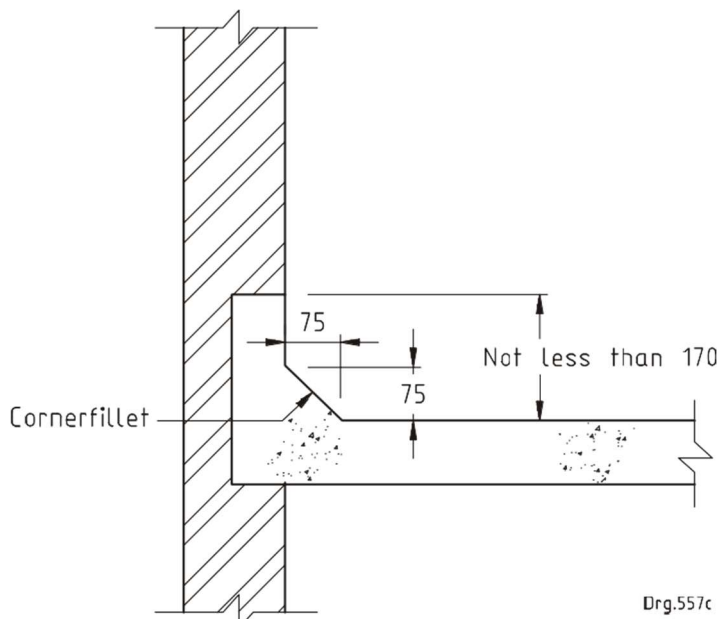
Upright Beam at Intersection Between Masonry Walls and Concrete Roof Slabs
